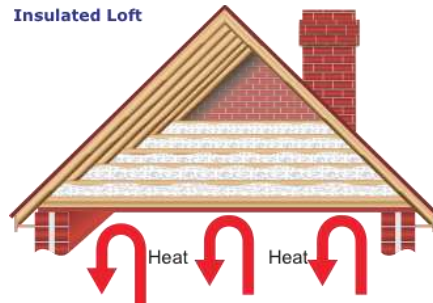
An insulated loft, with the insulation material shown between ceiling joists.
